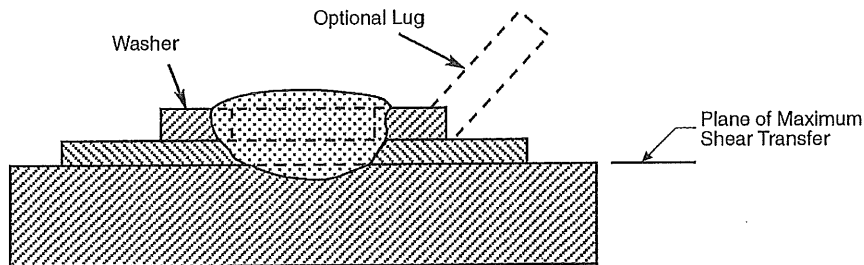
Arc Spot Weld Using Washer
